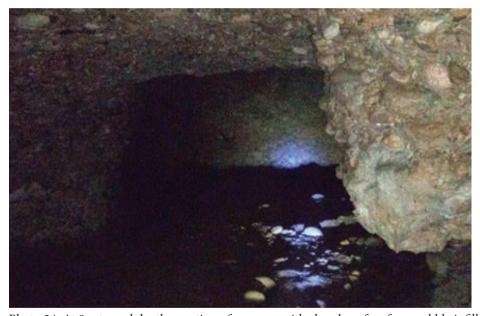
; At 8m tunnel depth a section of passages with chambers free from rubble infill was found, allowing free movement within the cavity.
